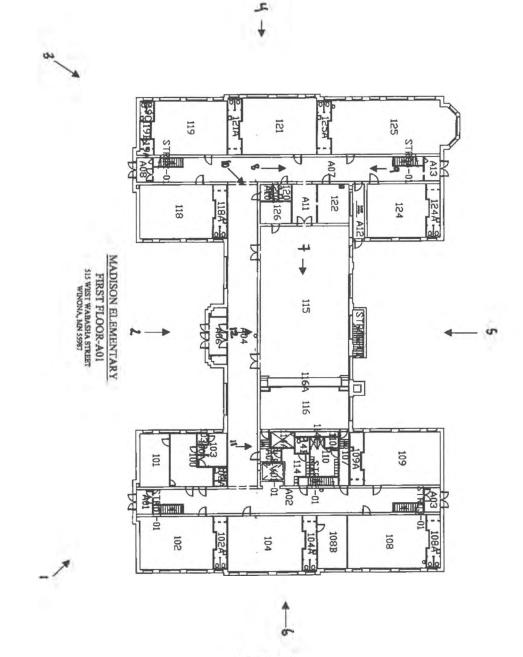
Madison School, First Floor Plan, 2010, Winona Public Schools.
